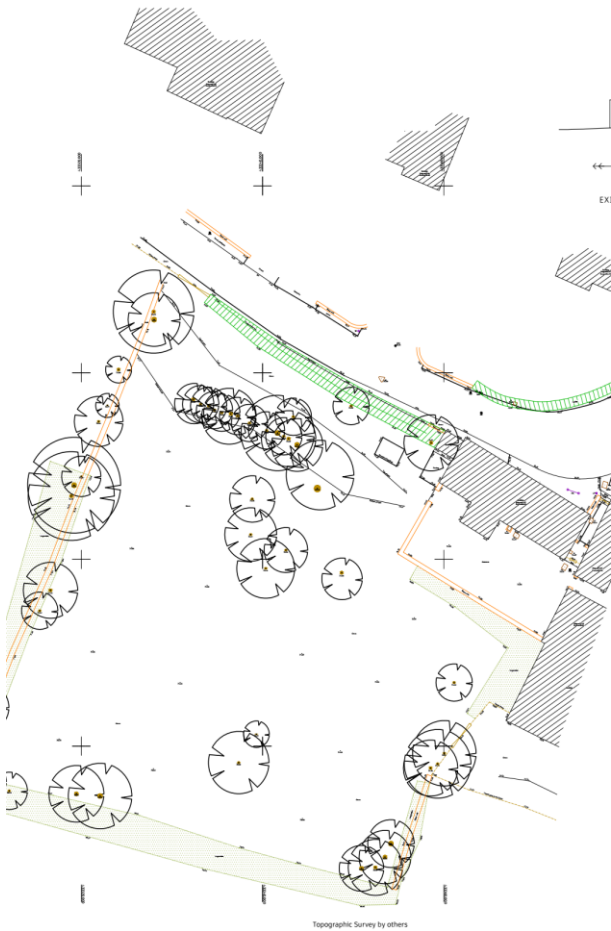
Block Plan showing the position of the land subject to the application for a replacement dwelling.
